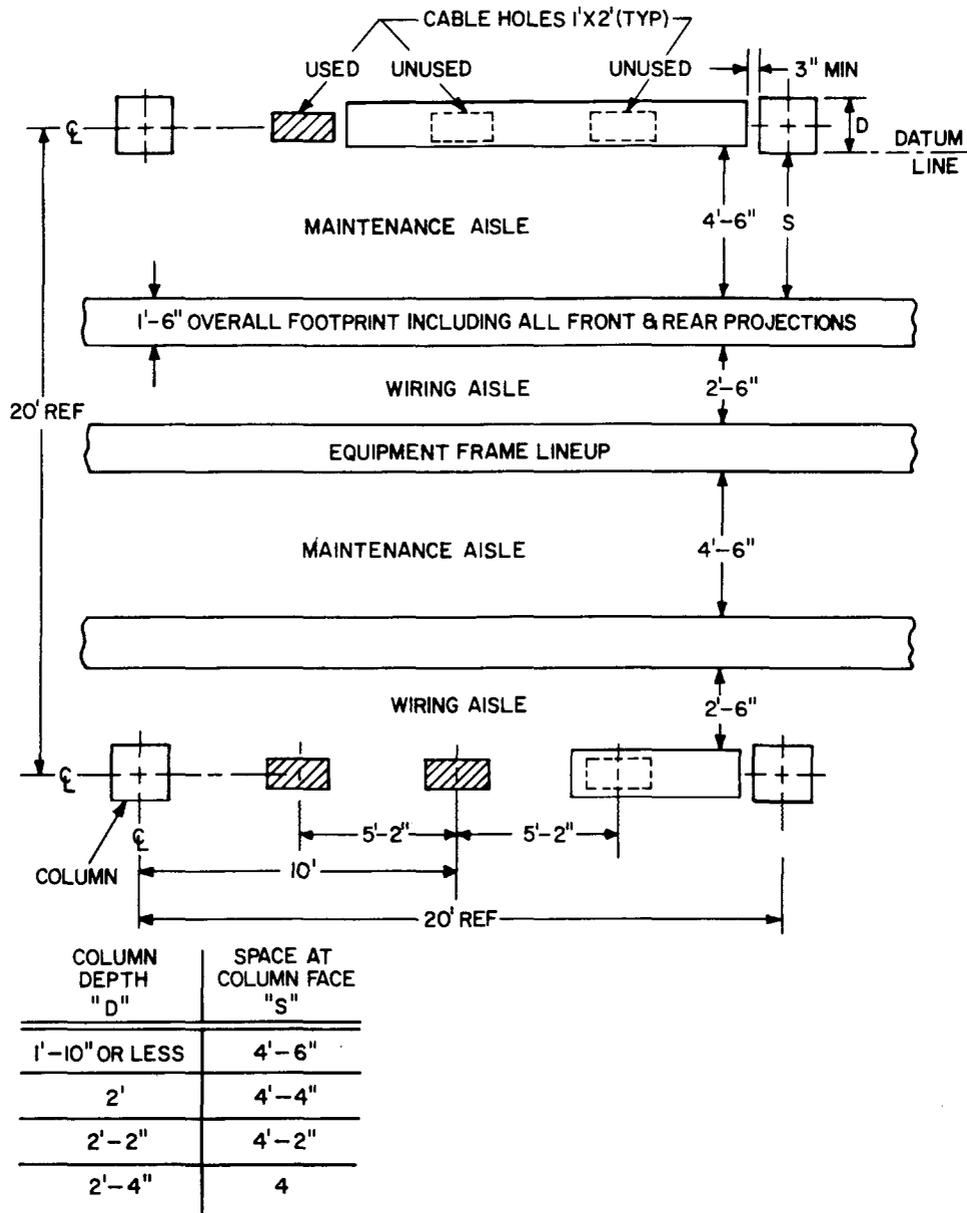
NEBS Standard Floor Plan for 18-Inch Deep Frames
